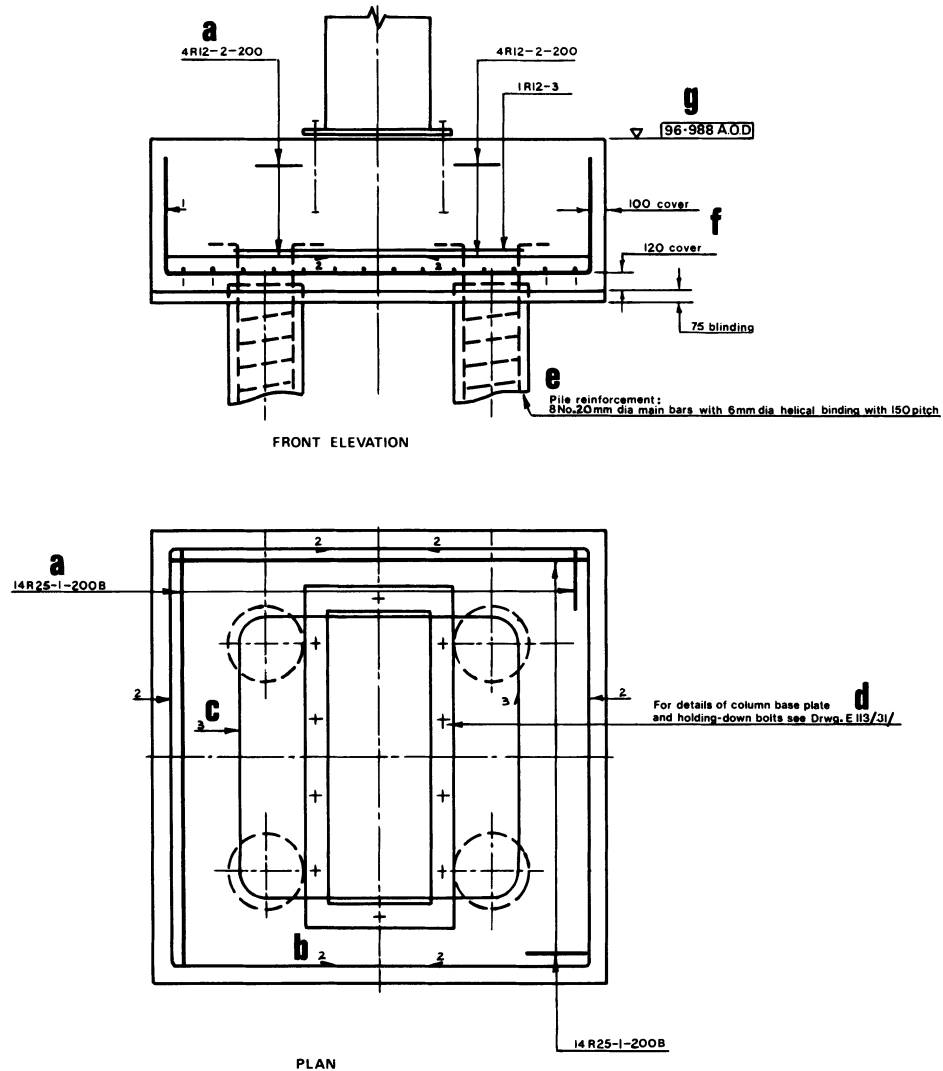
Bridge foundation – pile cap reinforcement detail
